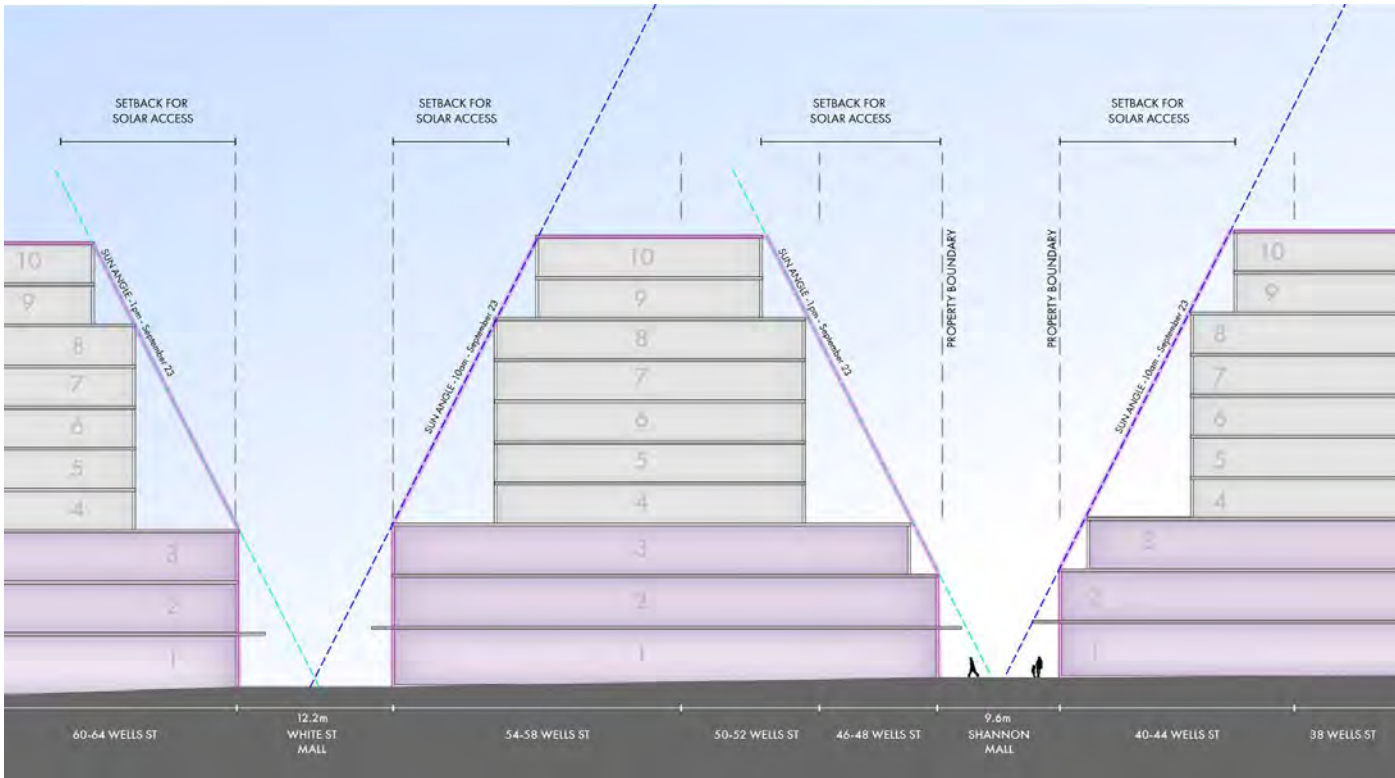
White Street Mall and Shannon Mall - Proposed building heights and sun angle
